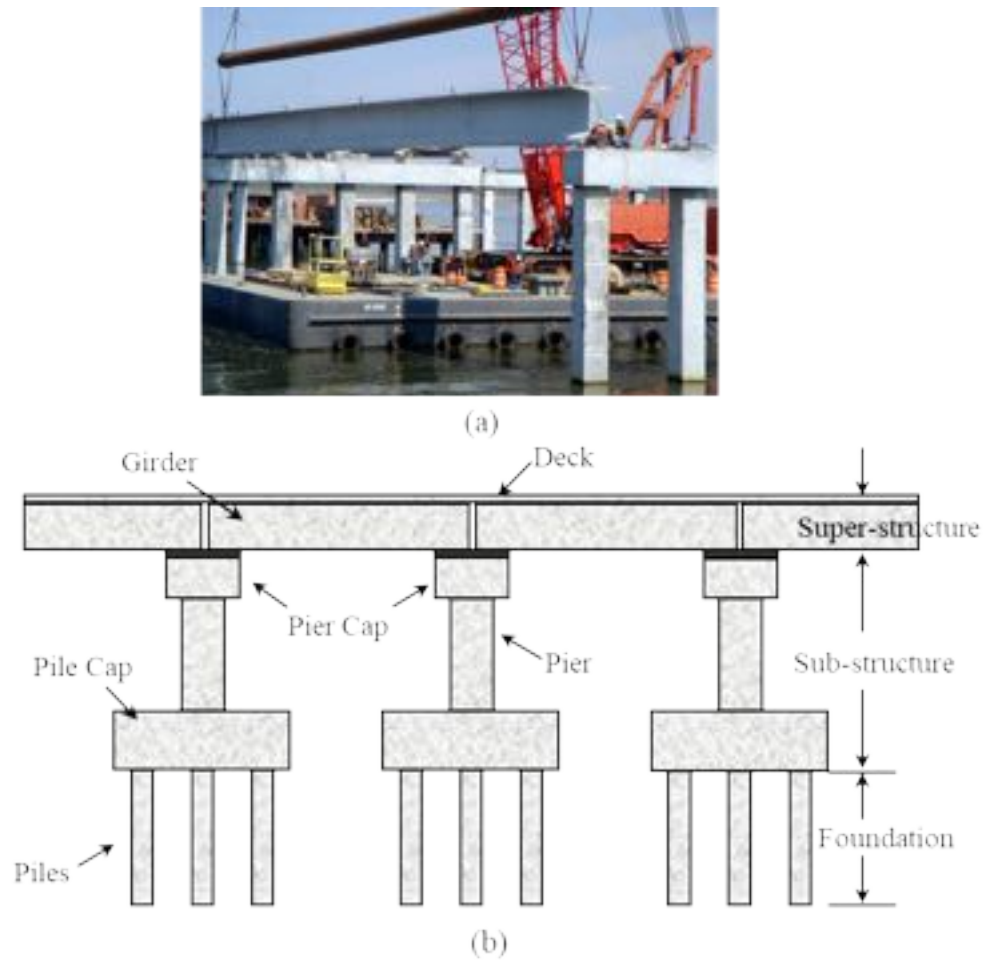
(a) Construction of a bridge (courtesy of Corven Engineering), (b) super-structure and sub-structure components on a bridge
